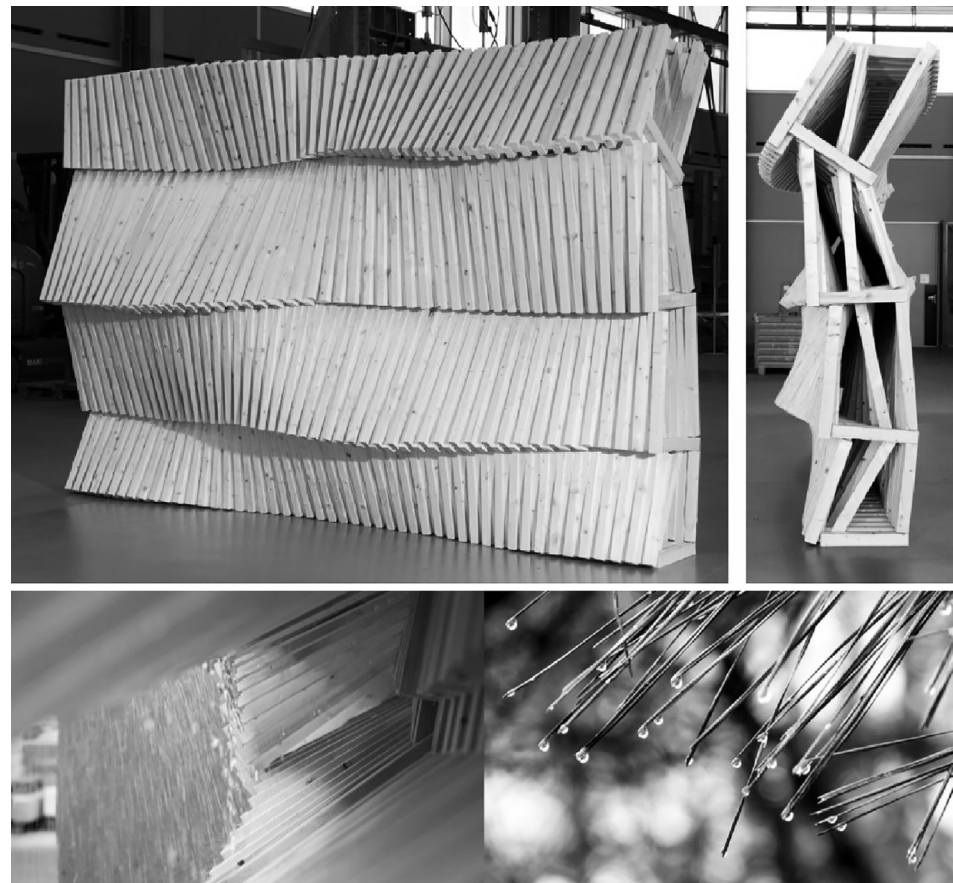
(Top) Project 1, full-scale wall prototype; (bottom) water shielding through sacrificial layer.
